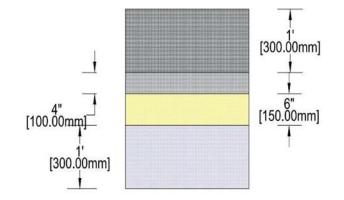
Case:3 Design layer thickness of Rigid Pavement
